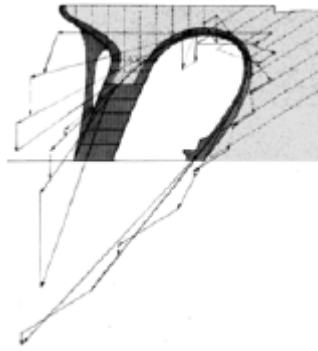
Gaudí's graphical design for the columns and retaining wall of Park Guell, from Rubió, 1913. (Block P. , Equilibrium systems: Studies in Masonry Structure, 2005)
